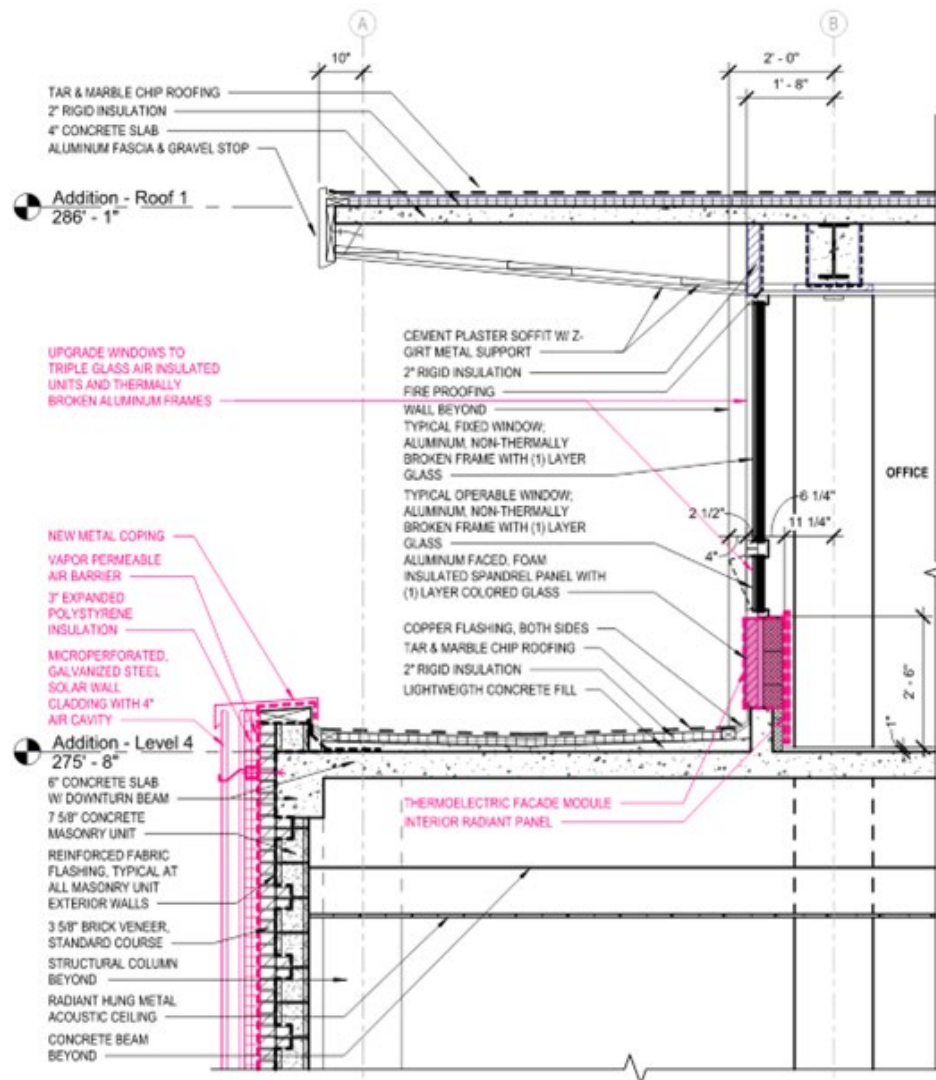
Typical exterior wall for the addition building, indicating existing facade components (in black) and retrofit design strategies (in color) (Source: Author [12]).
